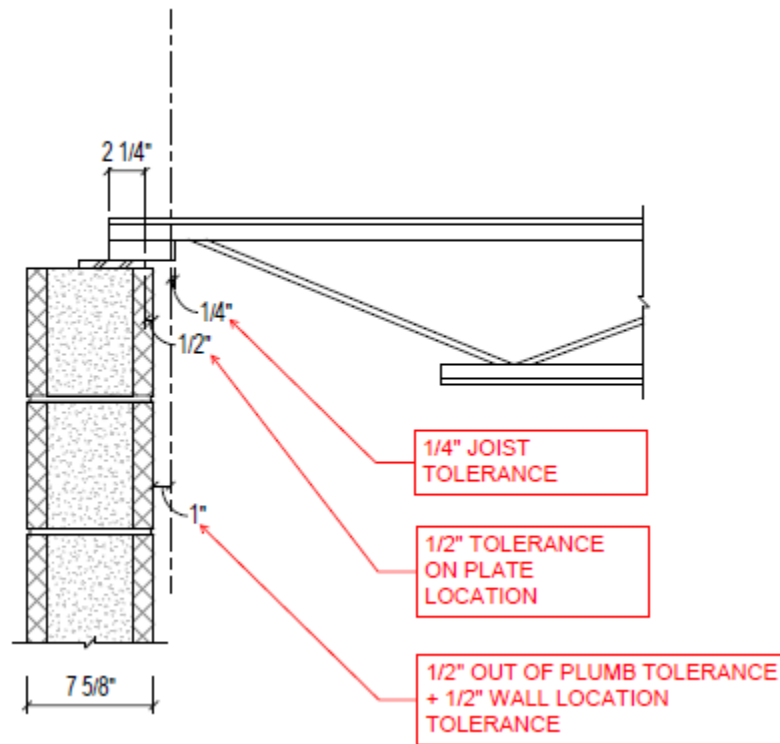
Joist Bearing - As Built Within Tolerance
